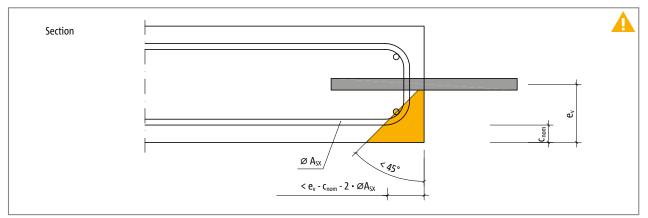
Schöck Dorn type LD: Position of the longitudunal reinforcement in relation to the front face of the slab
